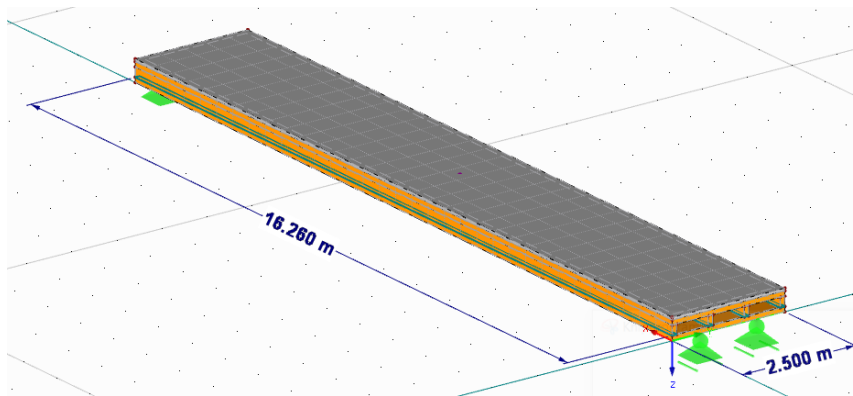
RFEM model closed CLT plus glulam rib floor with concrete top layer
